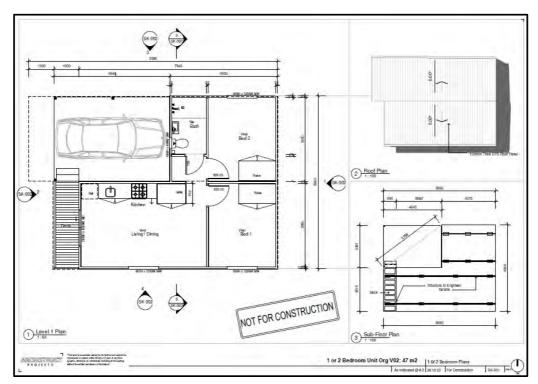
Proposed Unit Floor Plan. Source: Applicants submission
